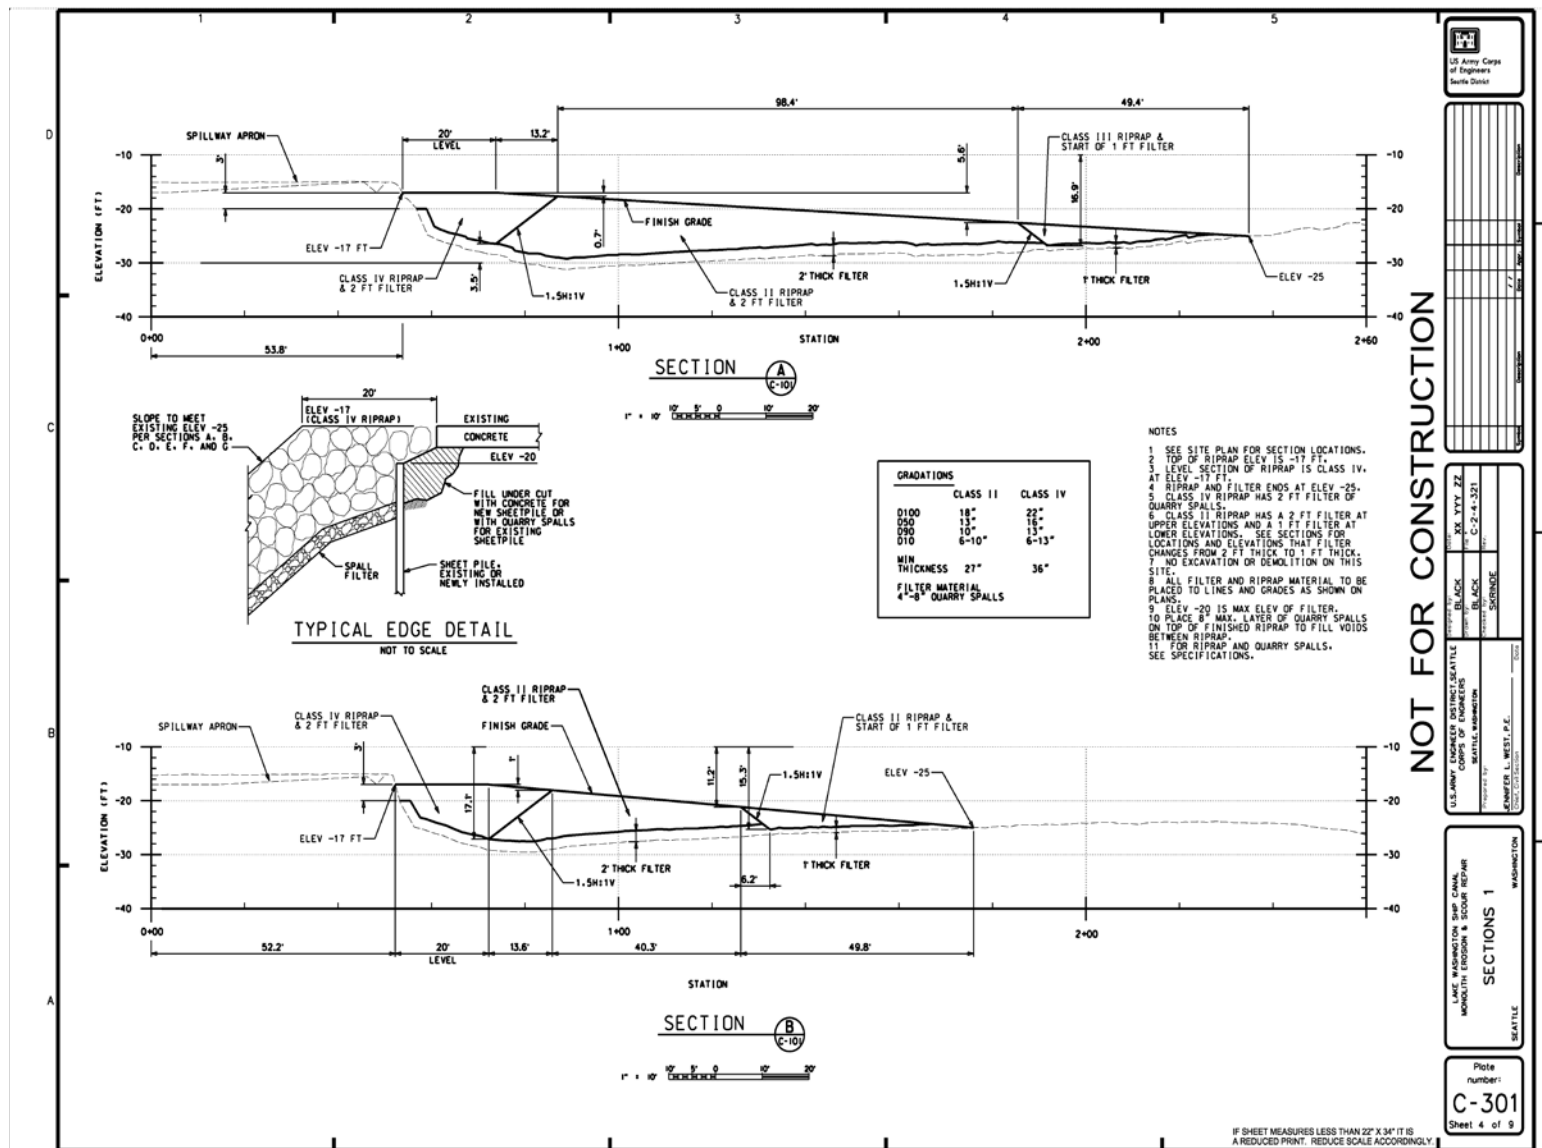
Cross Section showing channel scour and proposed rock placement in one section.
